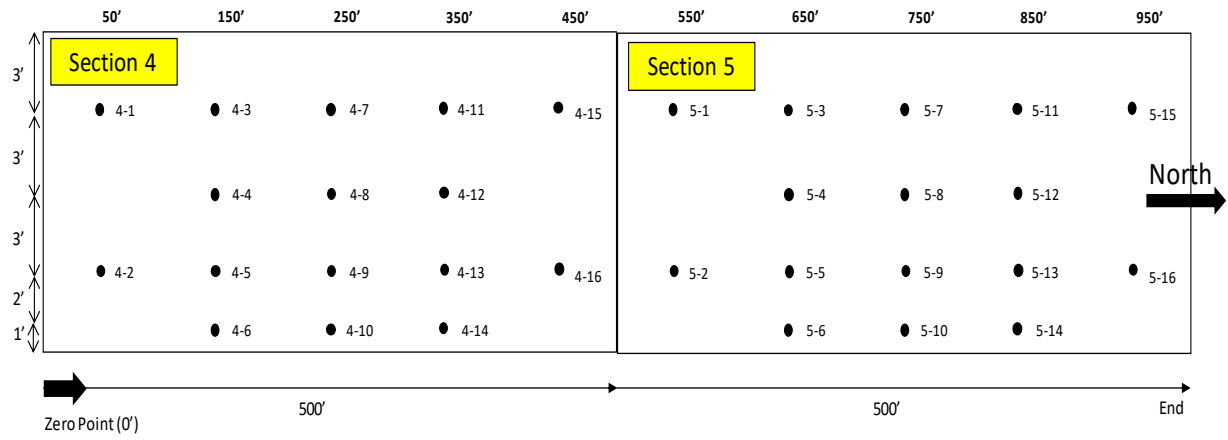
Density and Core Locations in Rigid Pavement Test Section.
